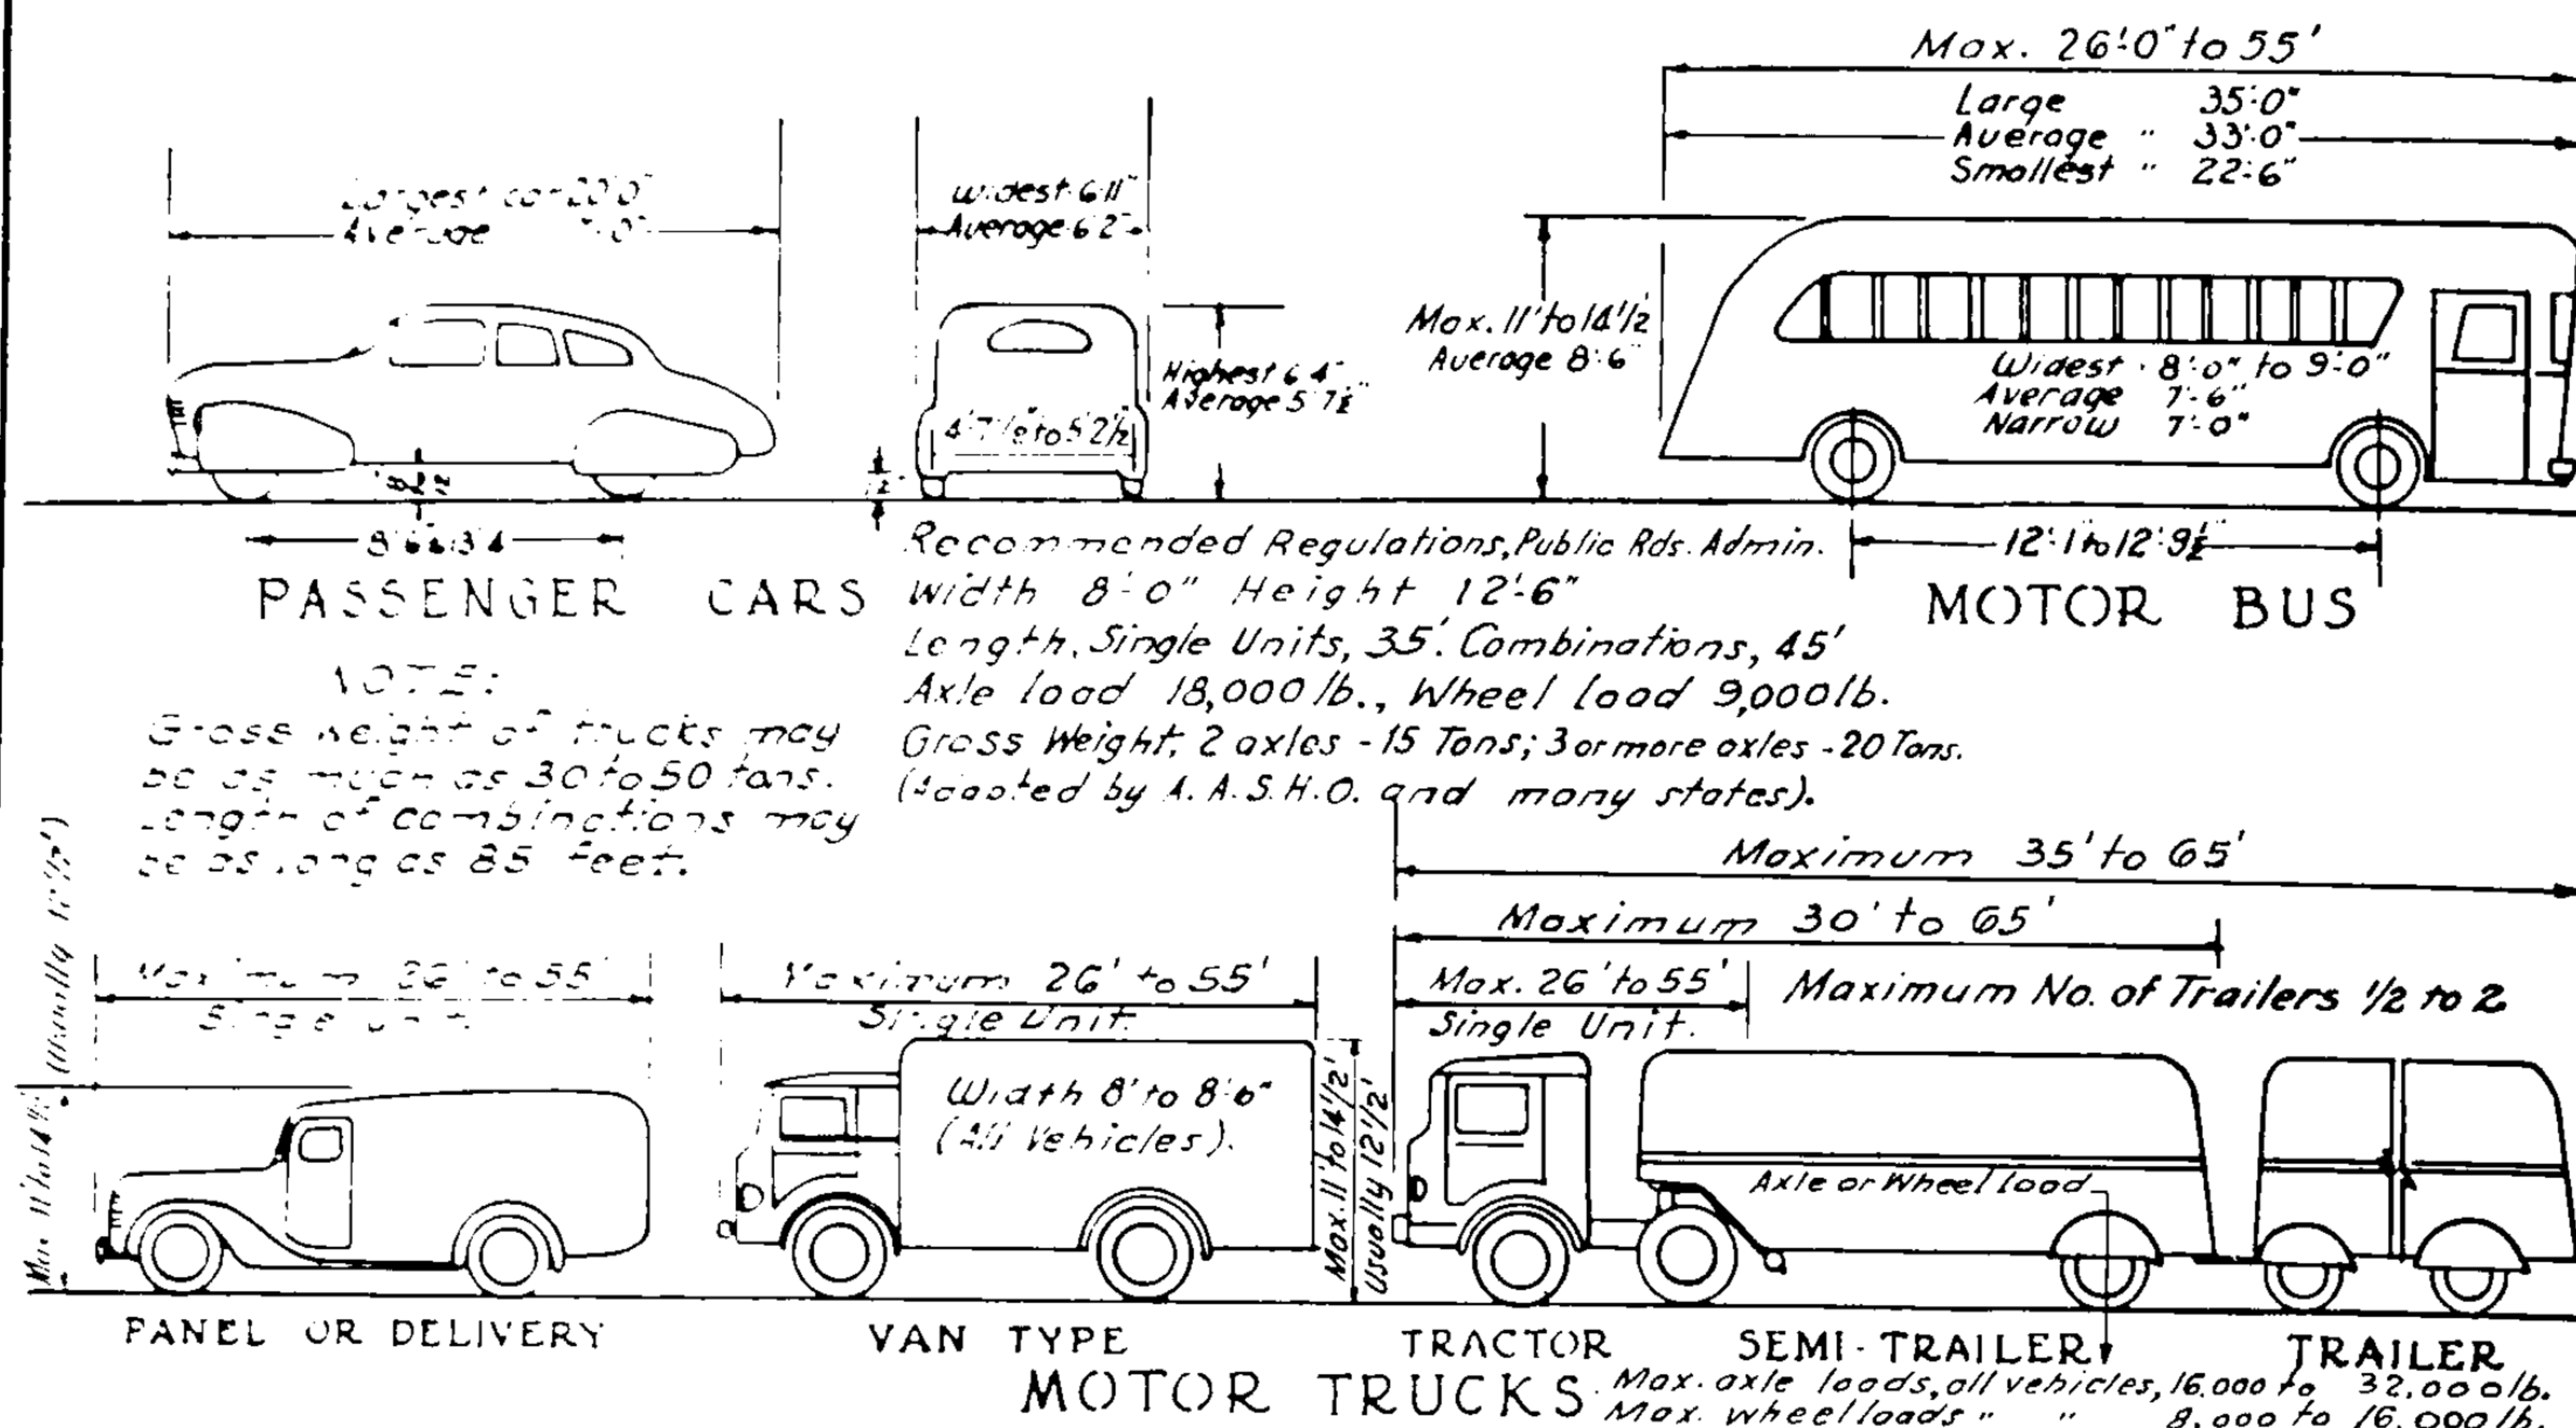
FIG. A - DIMENSIONS OF MOTOR VEHICLES.
